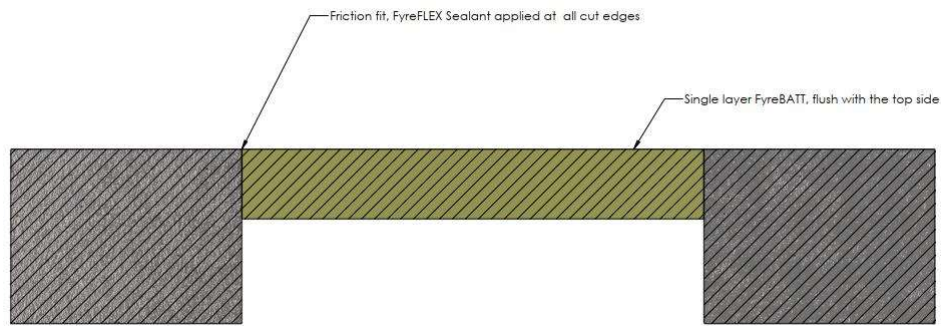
Blank seal protected with single layer of Trafalgar FyreBATT in floors
